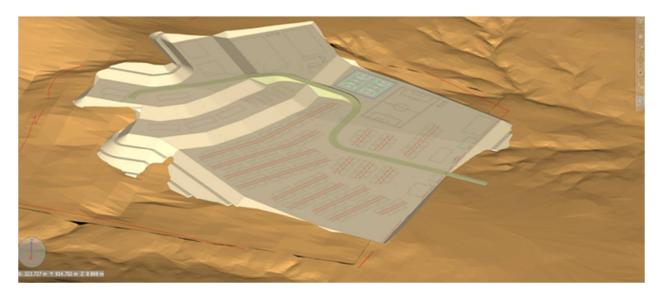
33D Isometric of Permanent Camp with Bulk Earthworks Terraces
